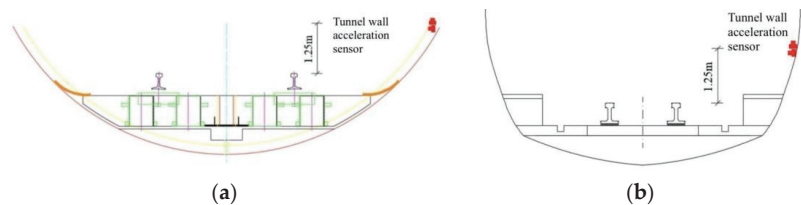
Layout of tunnel wall acceleration test points. (a) Cast-in-place SSFST section. (b) OMT section.
